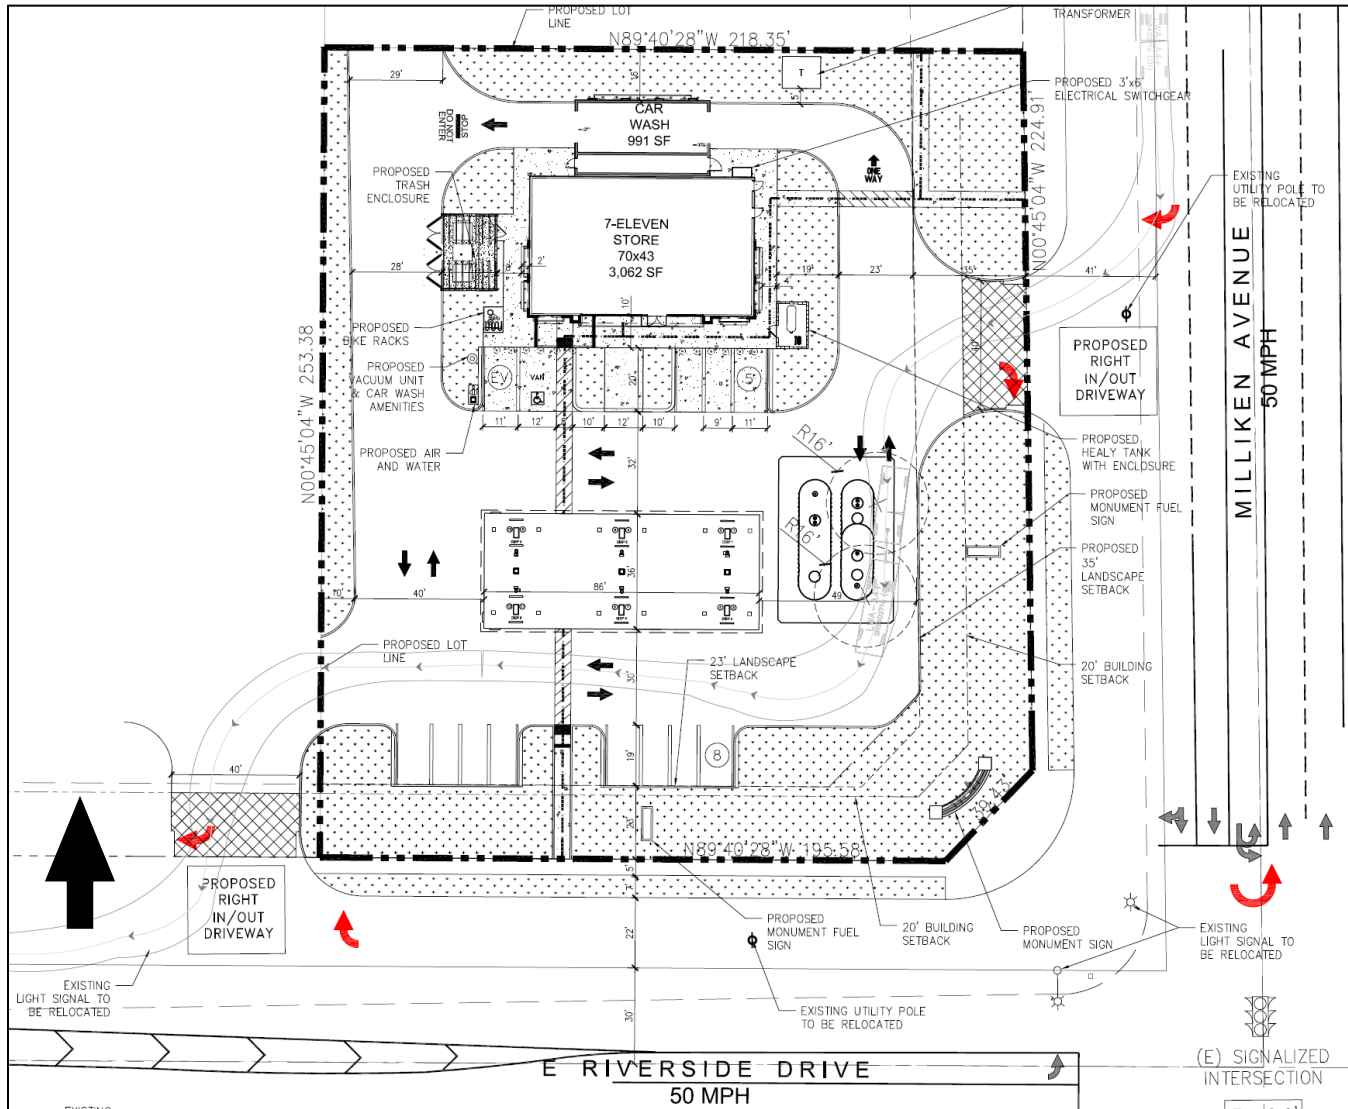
CONVENIENCE STORE FLOOR PLAN
